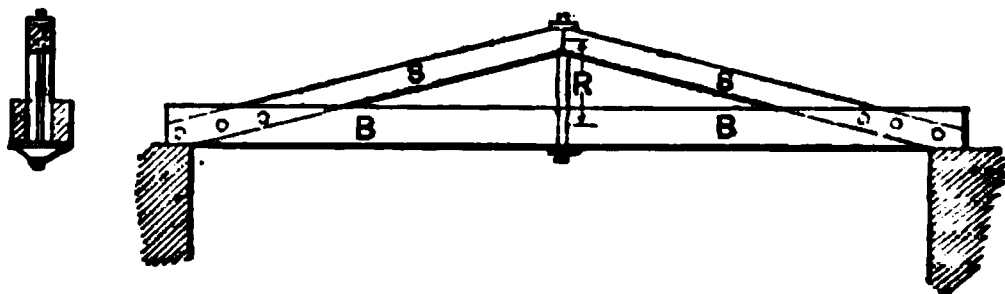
Trussed Wooden Girder. One Vertical Tie
